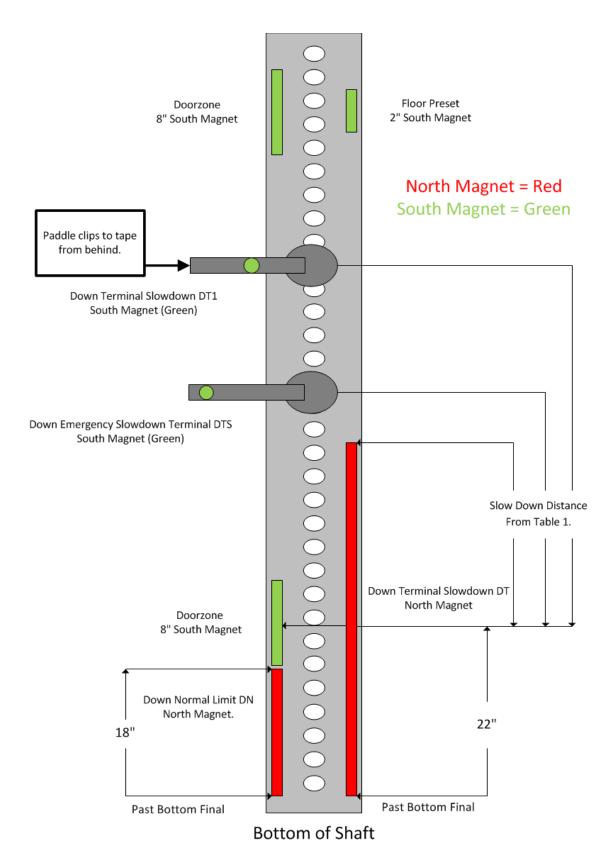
B: Typical Slowdown and door zone layout on tape. (Bottom Section)
